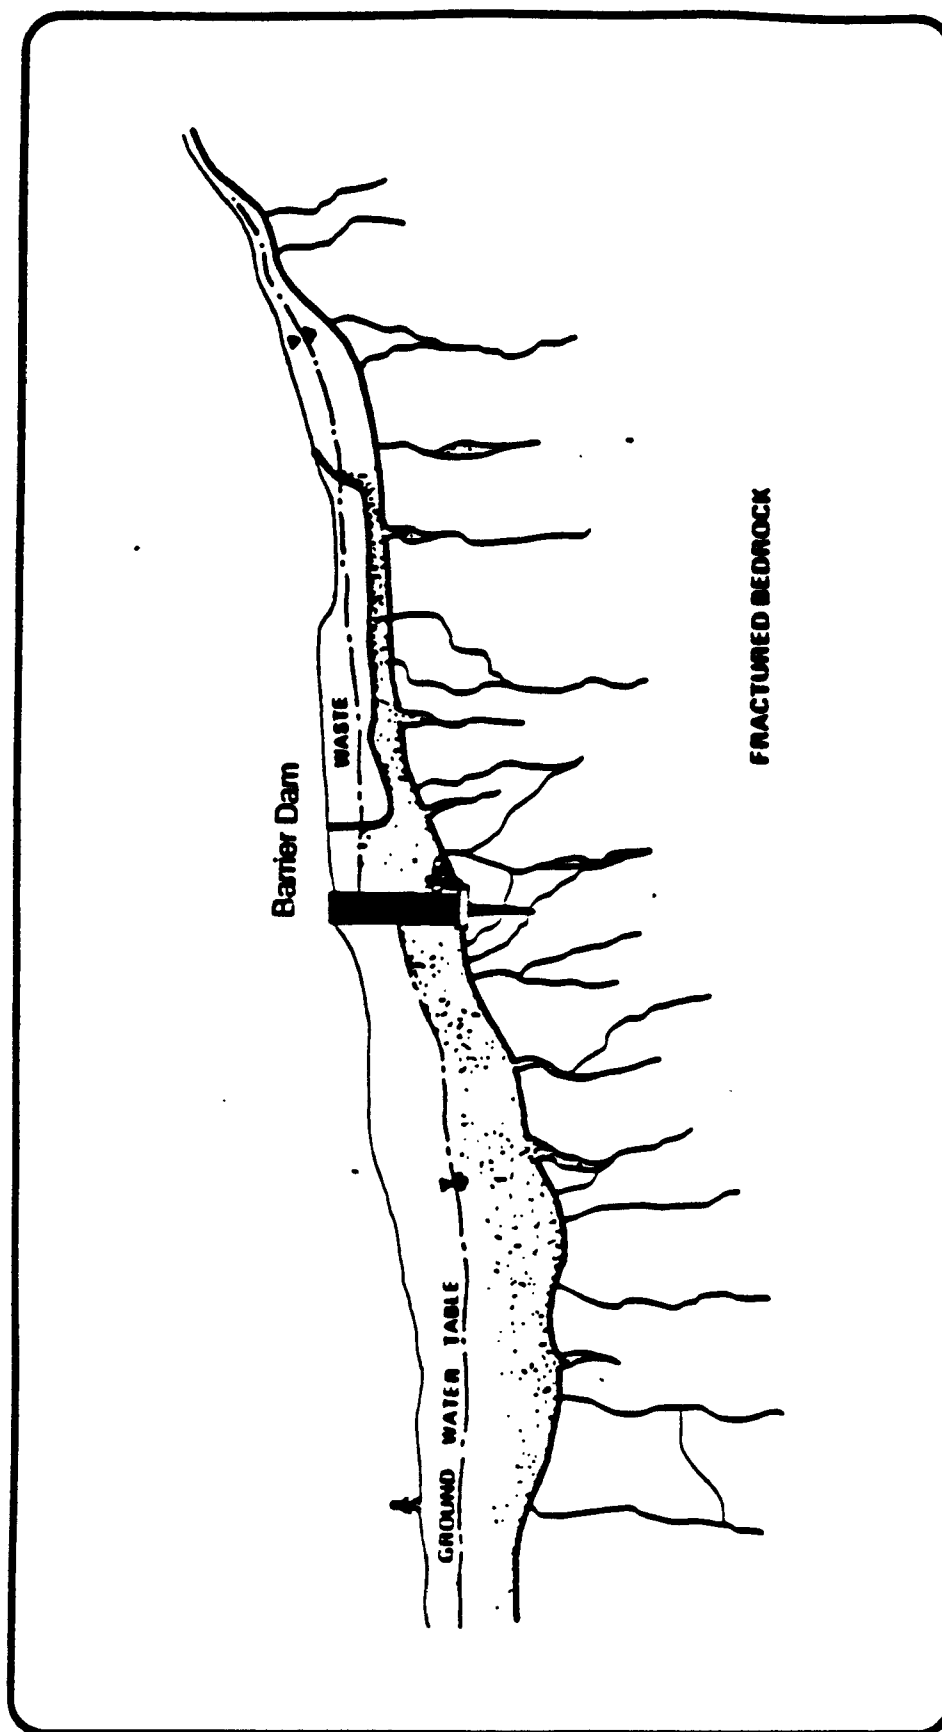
Schematic Cross-Section of Waste Disposal Site
